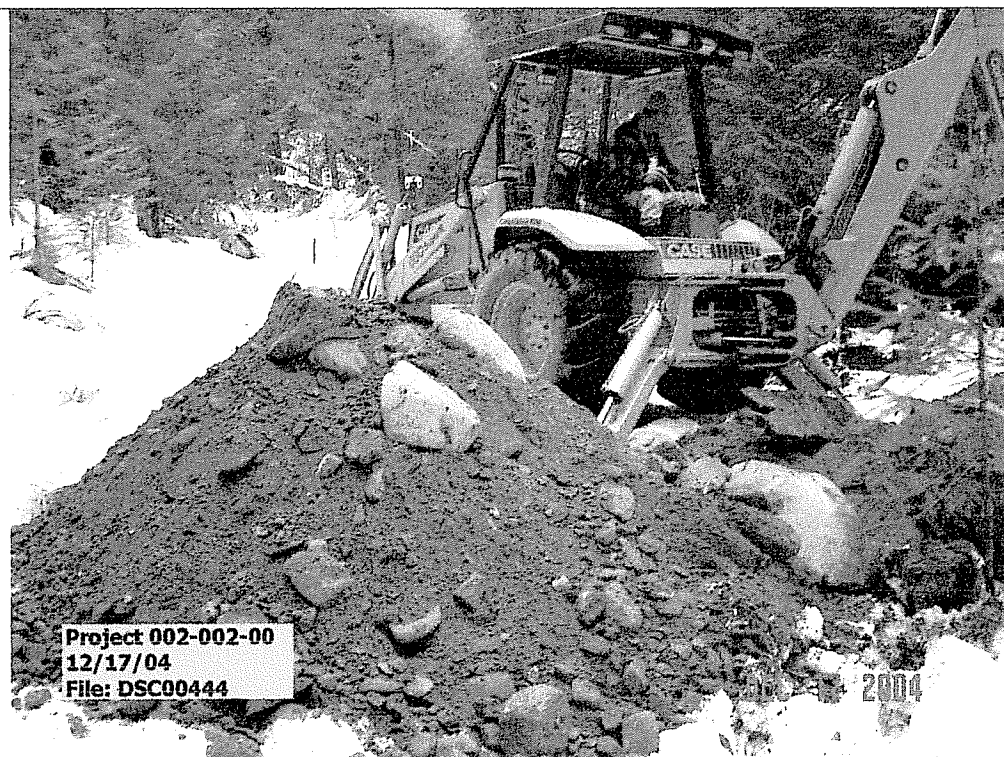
Photo looking into Test Pit 1. Front wall is to a depth of 7-feet, at which depth the dark gray hardpan was encountered. Refusal was at a depth of 7.5 feet below grade in the dark gray, damp, very dense, Silt with some gravel and trace sand. Large boulders are at a depth of 4 to 5.5 feet below grade.
